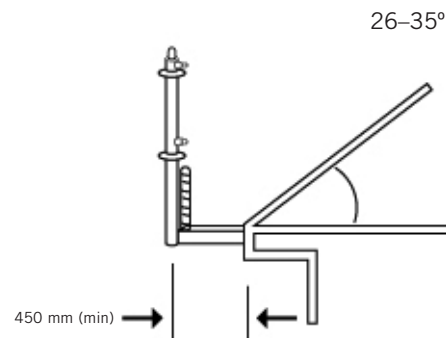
Roofs with pitch between 25 and 35 degrees require a two-plank platform guardrail system (end guardrail omitted for clarity)
